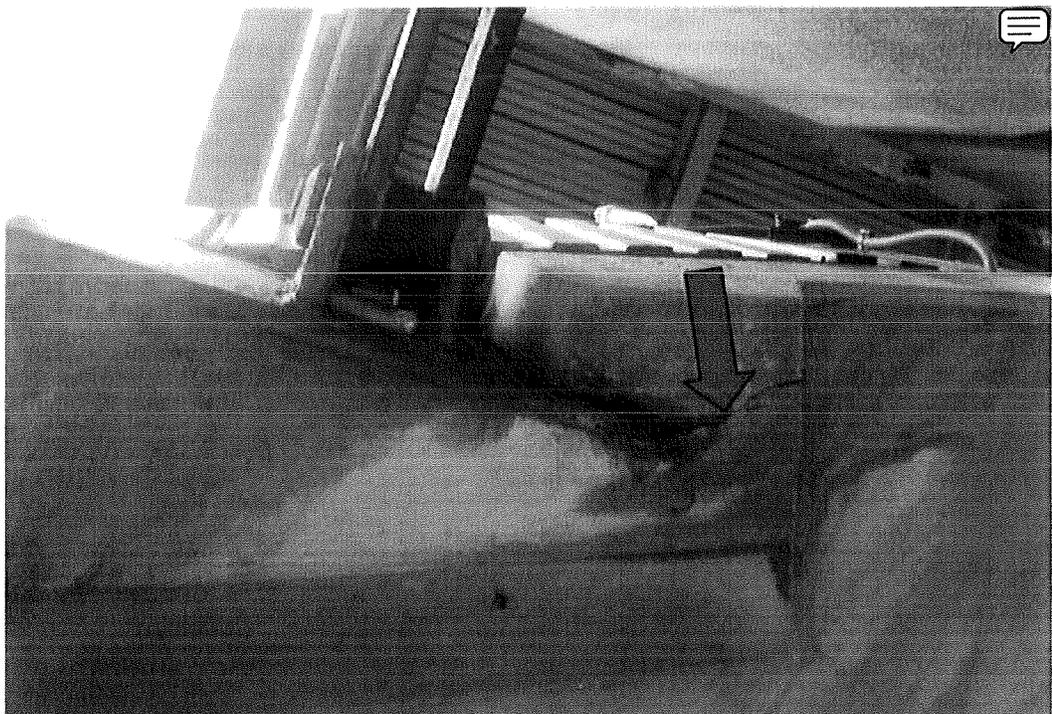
Cracked and hollow sounding encasement on the underside of the car ramp. Along Column Line 1 between Column Lines U4 and U5 at ramp to Sixth Floor. (Approx. 7 SF)
